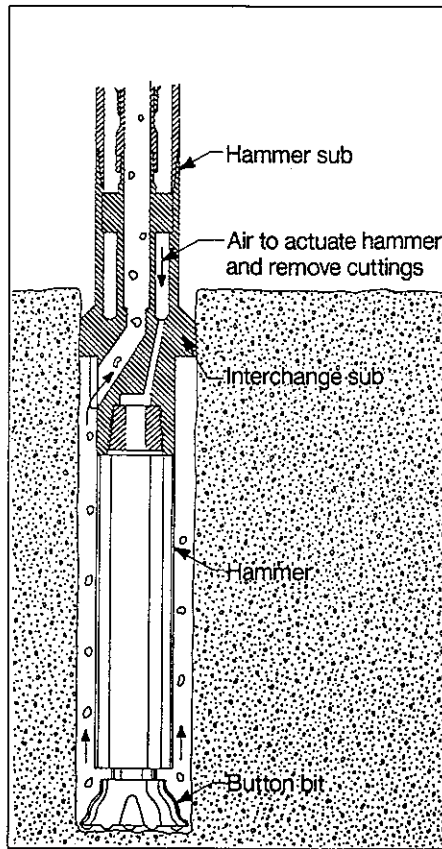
The cross-over channel in the interchange sub mounted on top of the hammer permits the cuttings to enter the inner casing. (Drilling Services Company)
